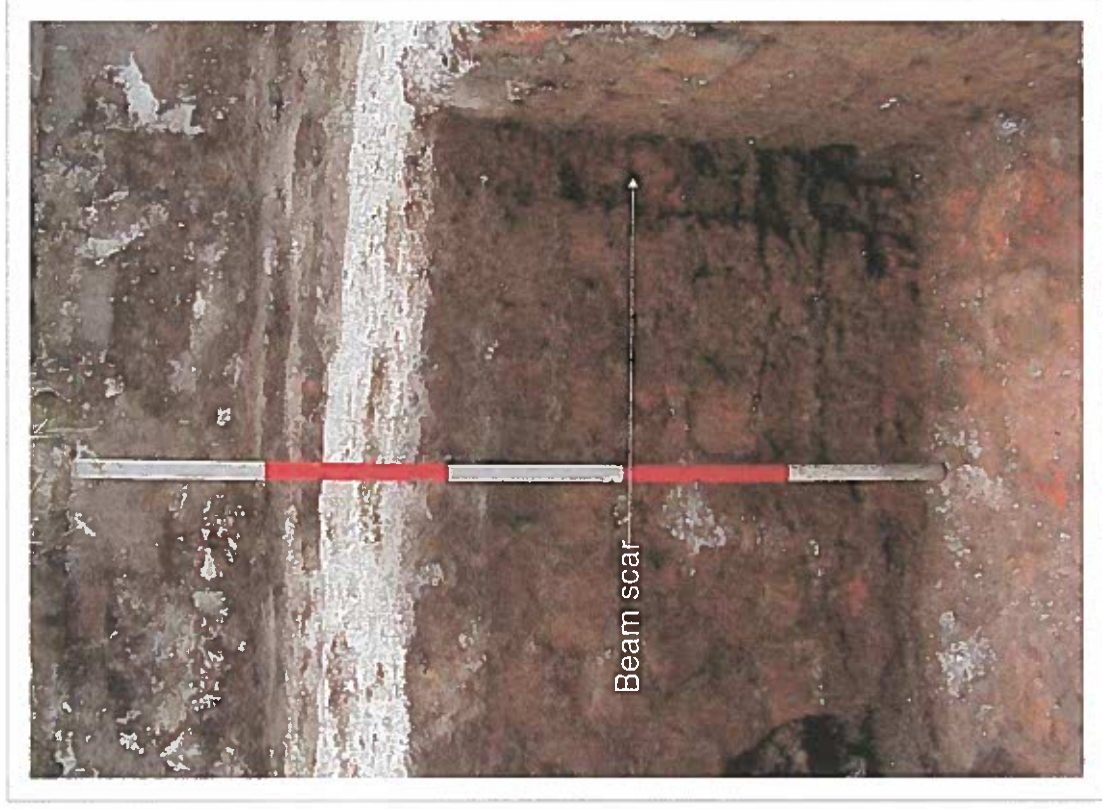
Detail of interface between inner eastern/ southern walls of south room, showing scarring on brickwork, probably caused by a beam. (Scale 1m. looking east)
